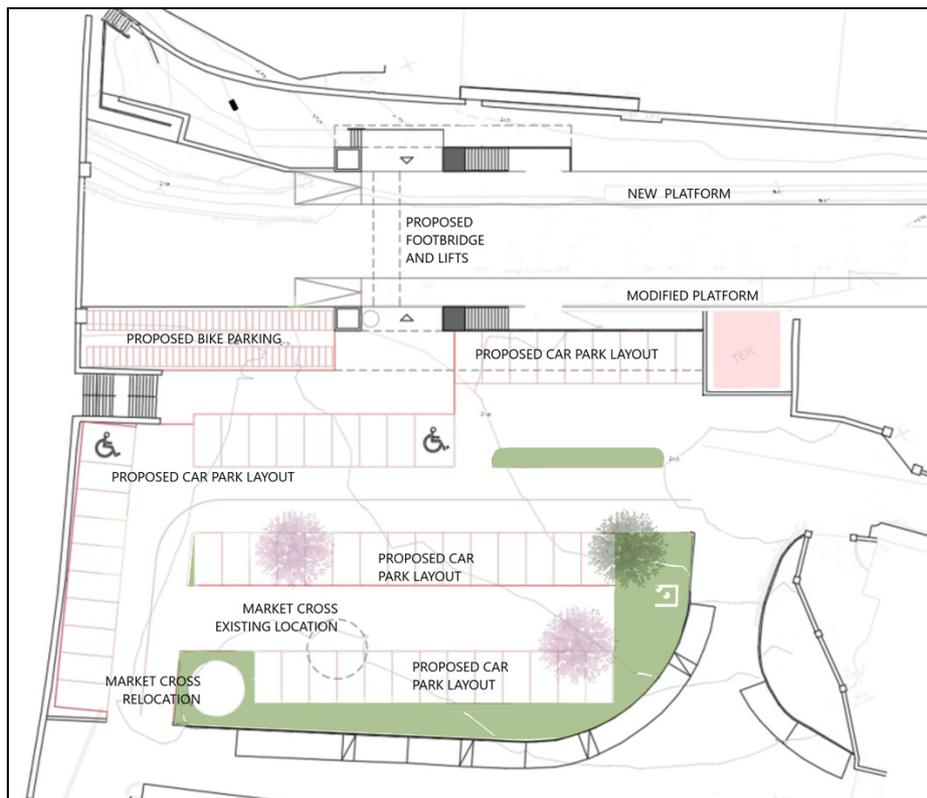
Plan scheme of the Proposed Footbridge and lifts and the Car Park layout at Kilcock Station
